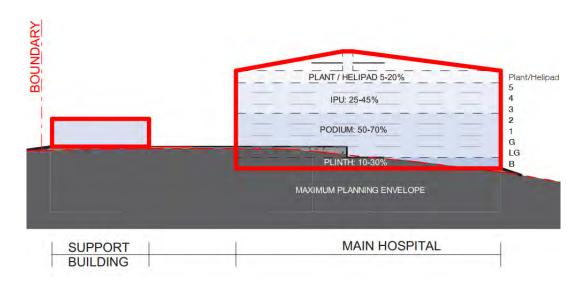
Northeast Elevation of Maximum Planning Envelope
